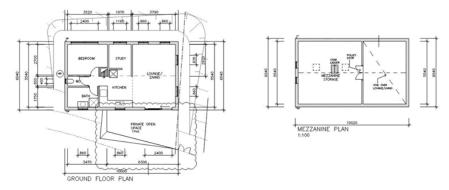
; Outbuilding Floor Plans (Steven Spizick Architect, 2021)
